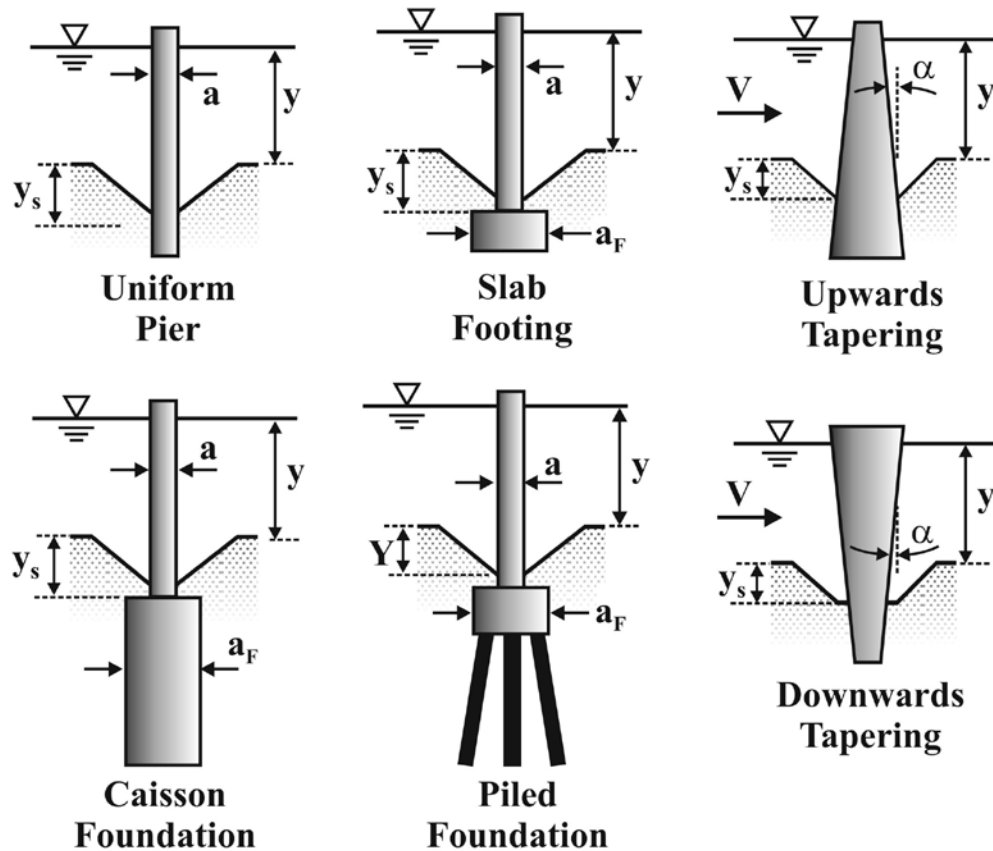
Common pier structures comprise a column on a slab footing, or column on pile cap with underpinning piles (Melville and Coleman 2000)
